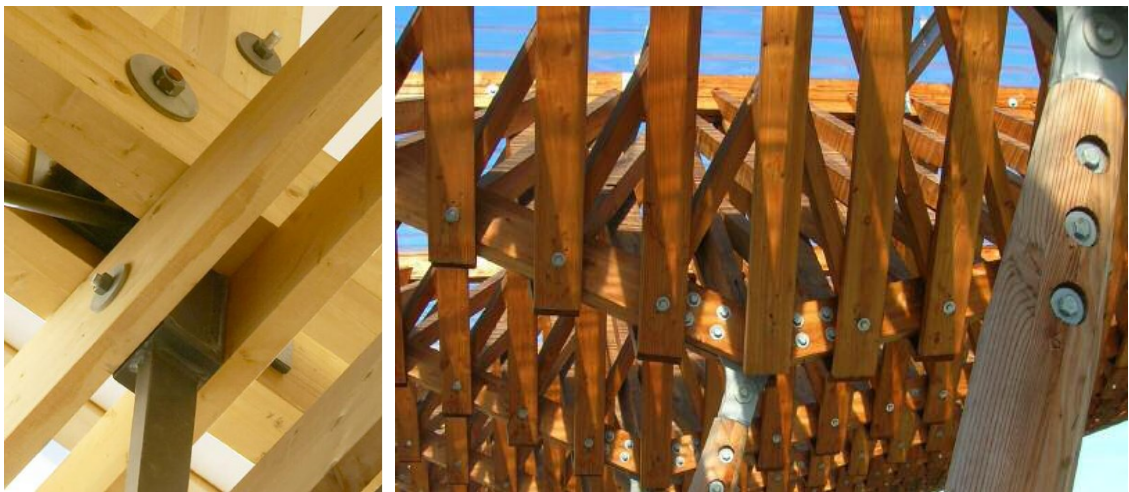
Bolt connections as typically used in timber structures (TRADA Wood Information, 2007).
